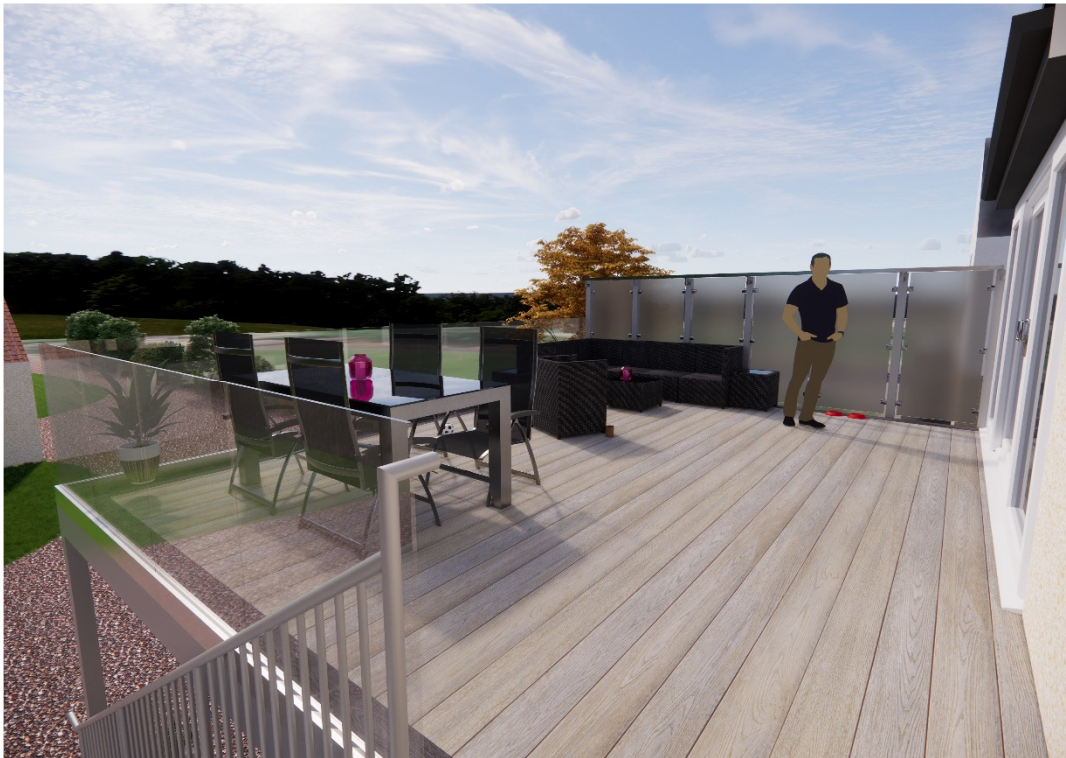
IMAGES AS PER PLANNER EMAIL 11th JULY 2023:
